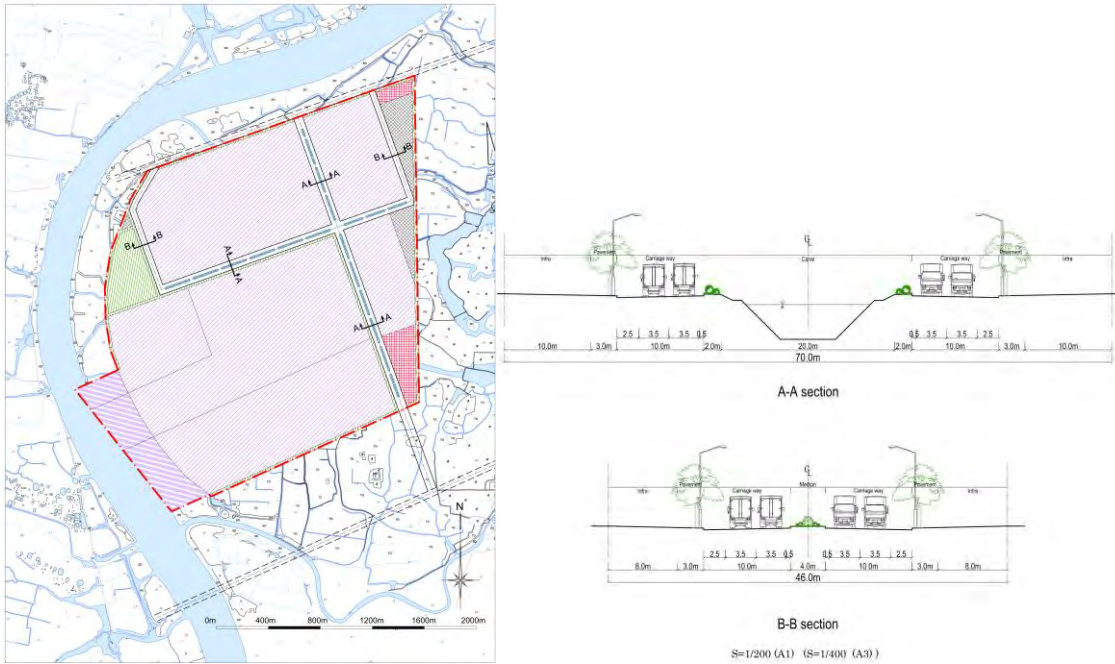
(3)-1 Road plan of Seaboard EZ
